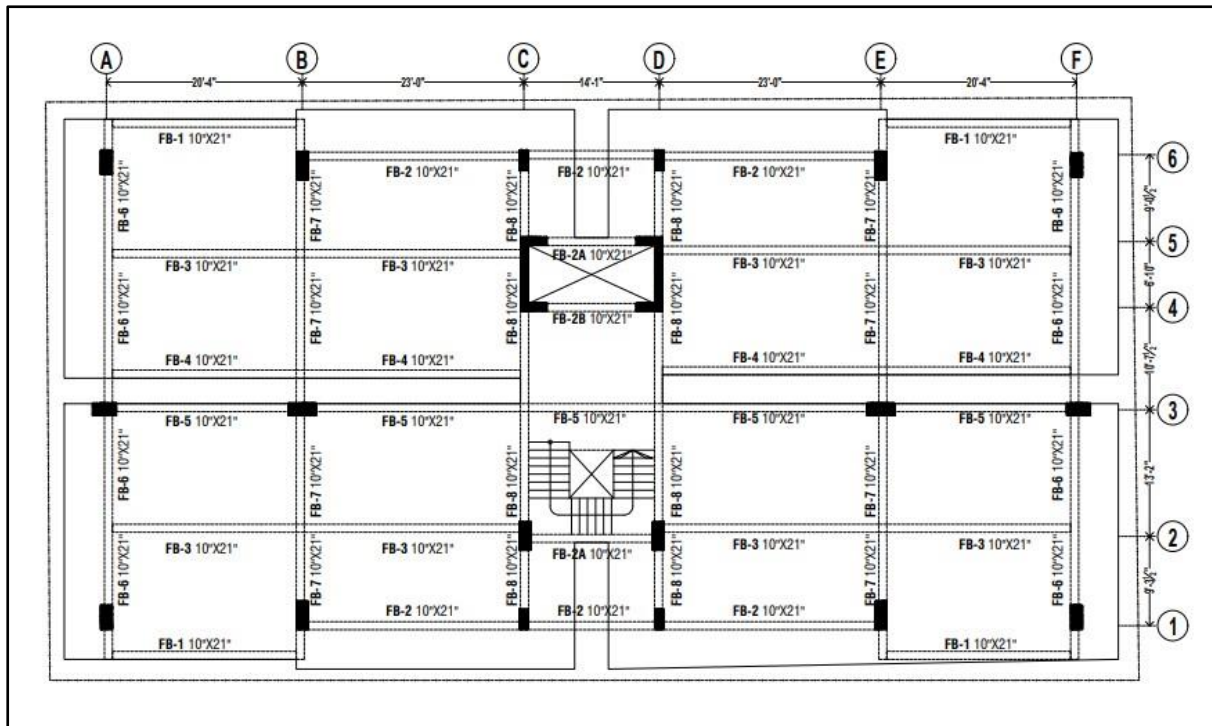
Plan View of 10 Story (G+9) Residential Building
